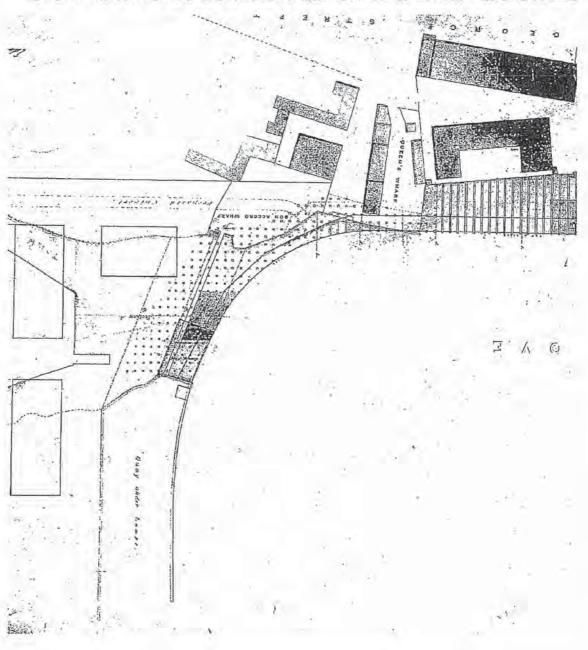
Detail of Plan of Extension of Semicircular Quay 1854, showing the plan for the timber piles and decking, as well as the intended Pitt Street extension and the proposed culvert for the Tank Stream. (Source: State Records NSW AO Plan 1282)
